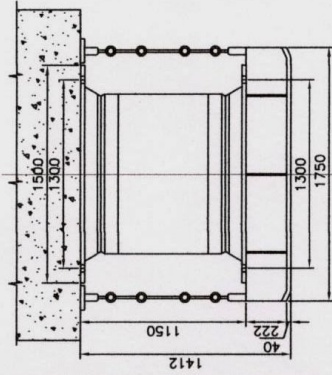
DETAILS OF RESIN ANCHOR BOLT ASSEMBLY
